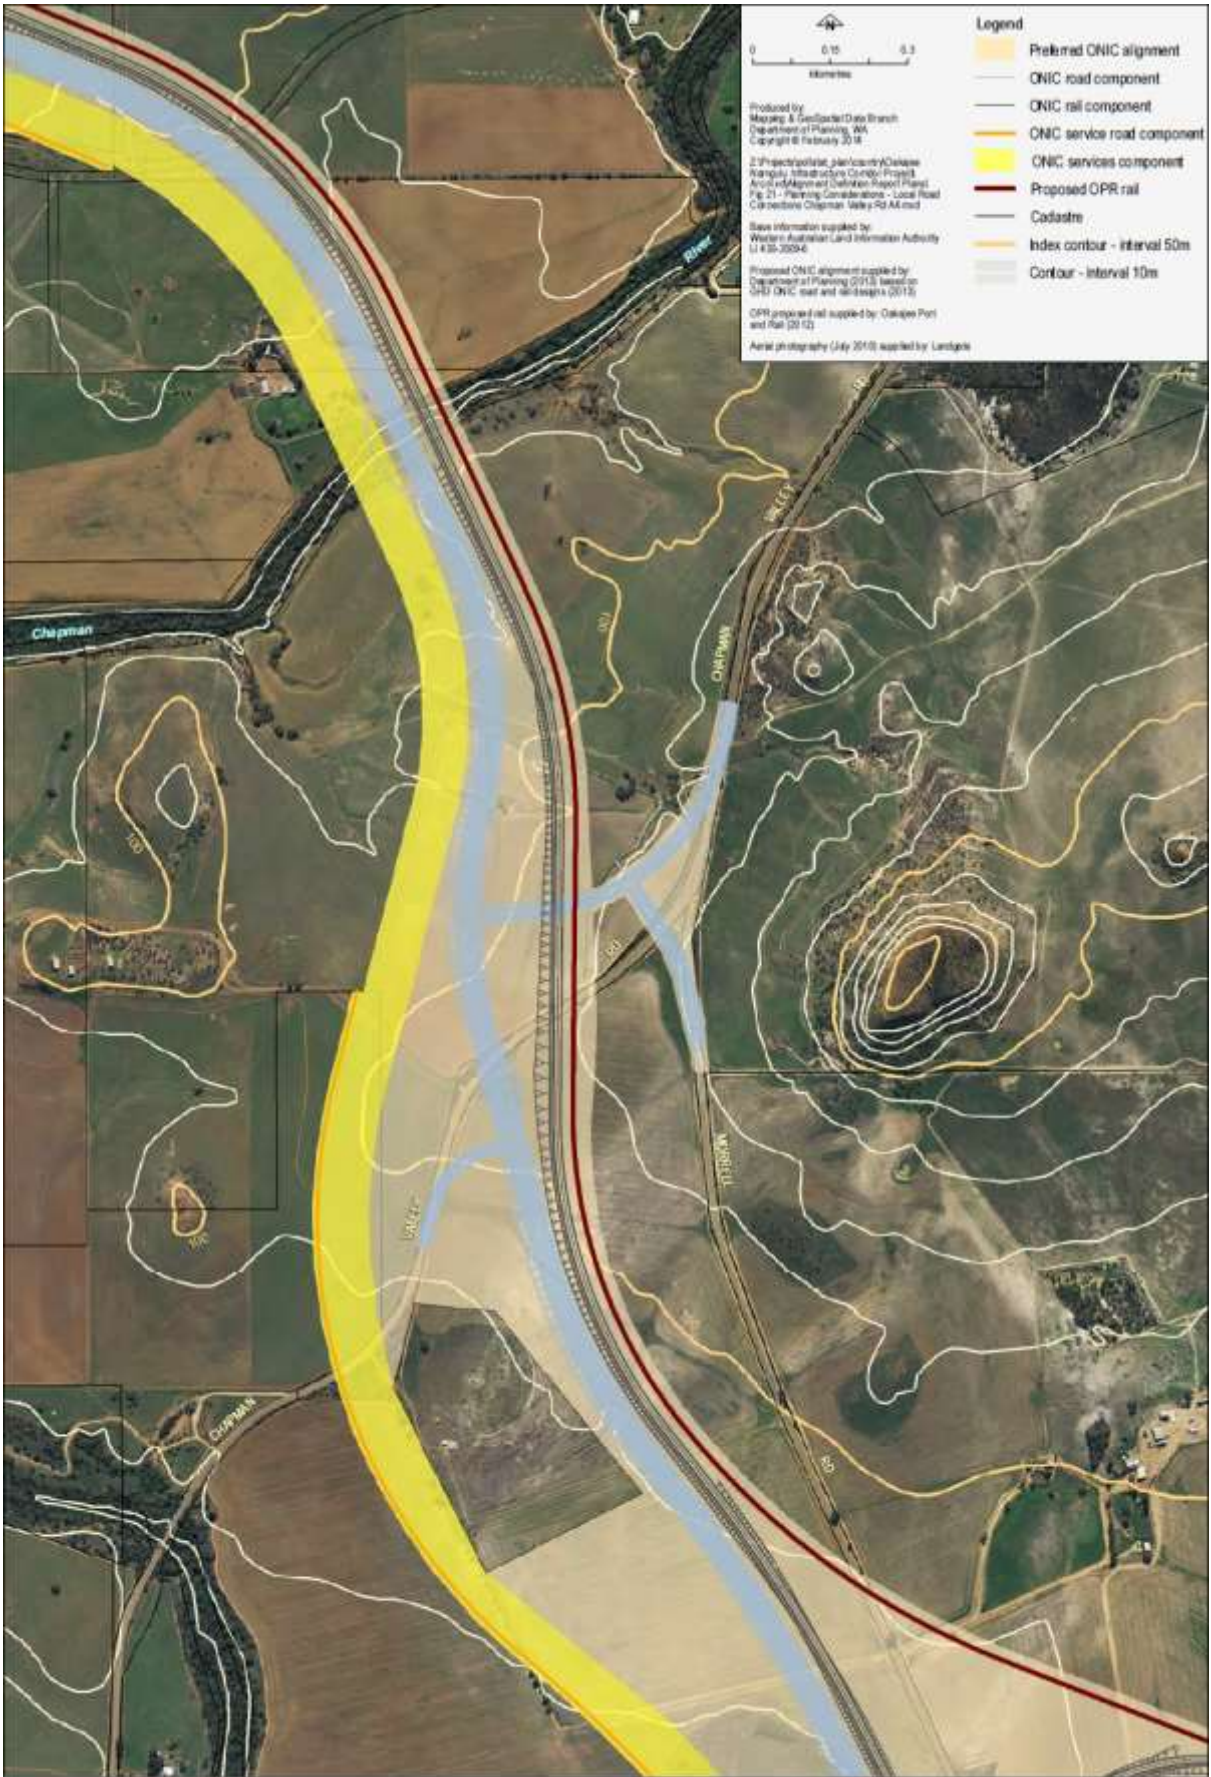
Planning considerations - Local road connections Chapman Valley Road and Morrell Road
